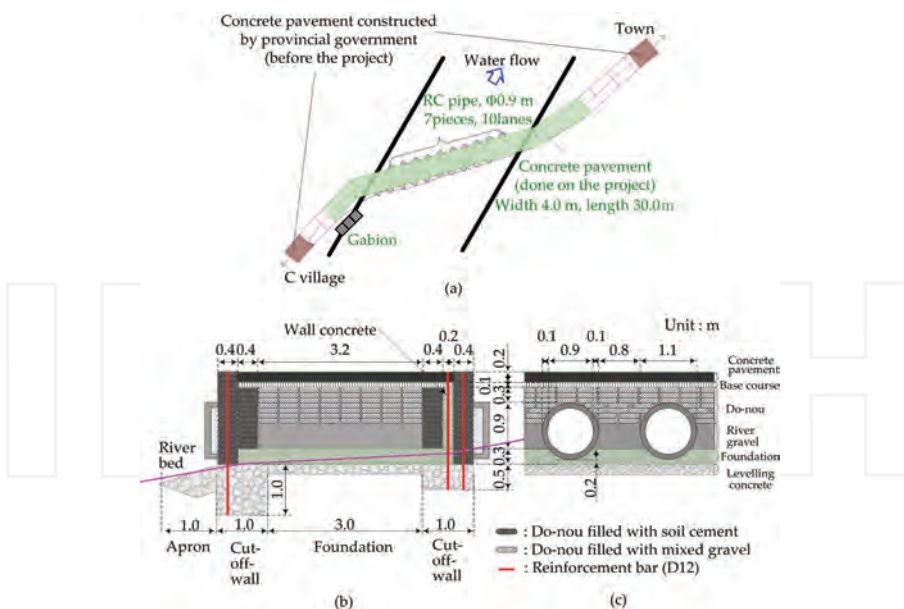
Plain and cross-sectional view of the vented ford: (a) Plain view; (b) longitudinal section view; (c) vertical cross-sectional view.
